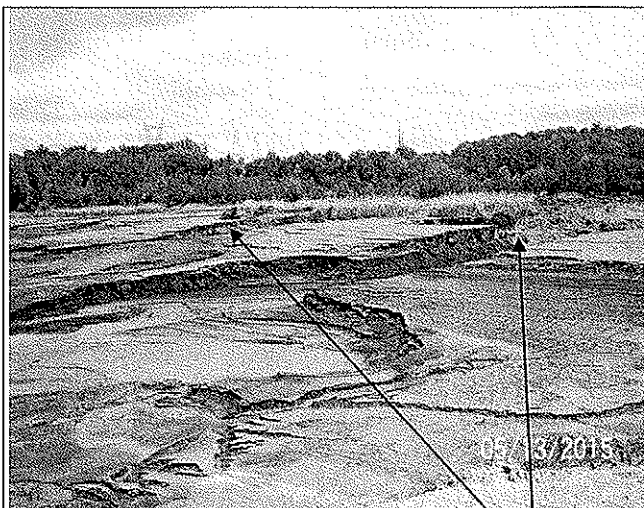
Dewatered Ash Pond E with dewatering trenches.
